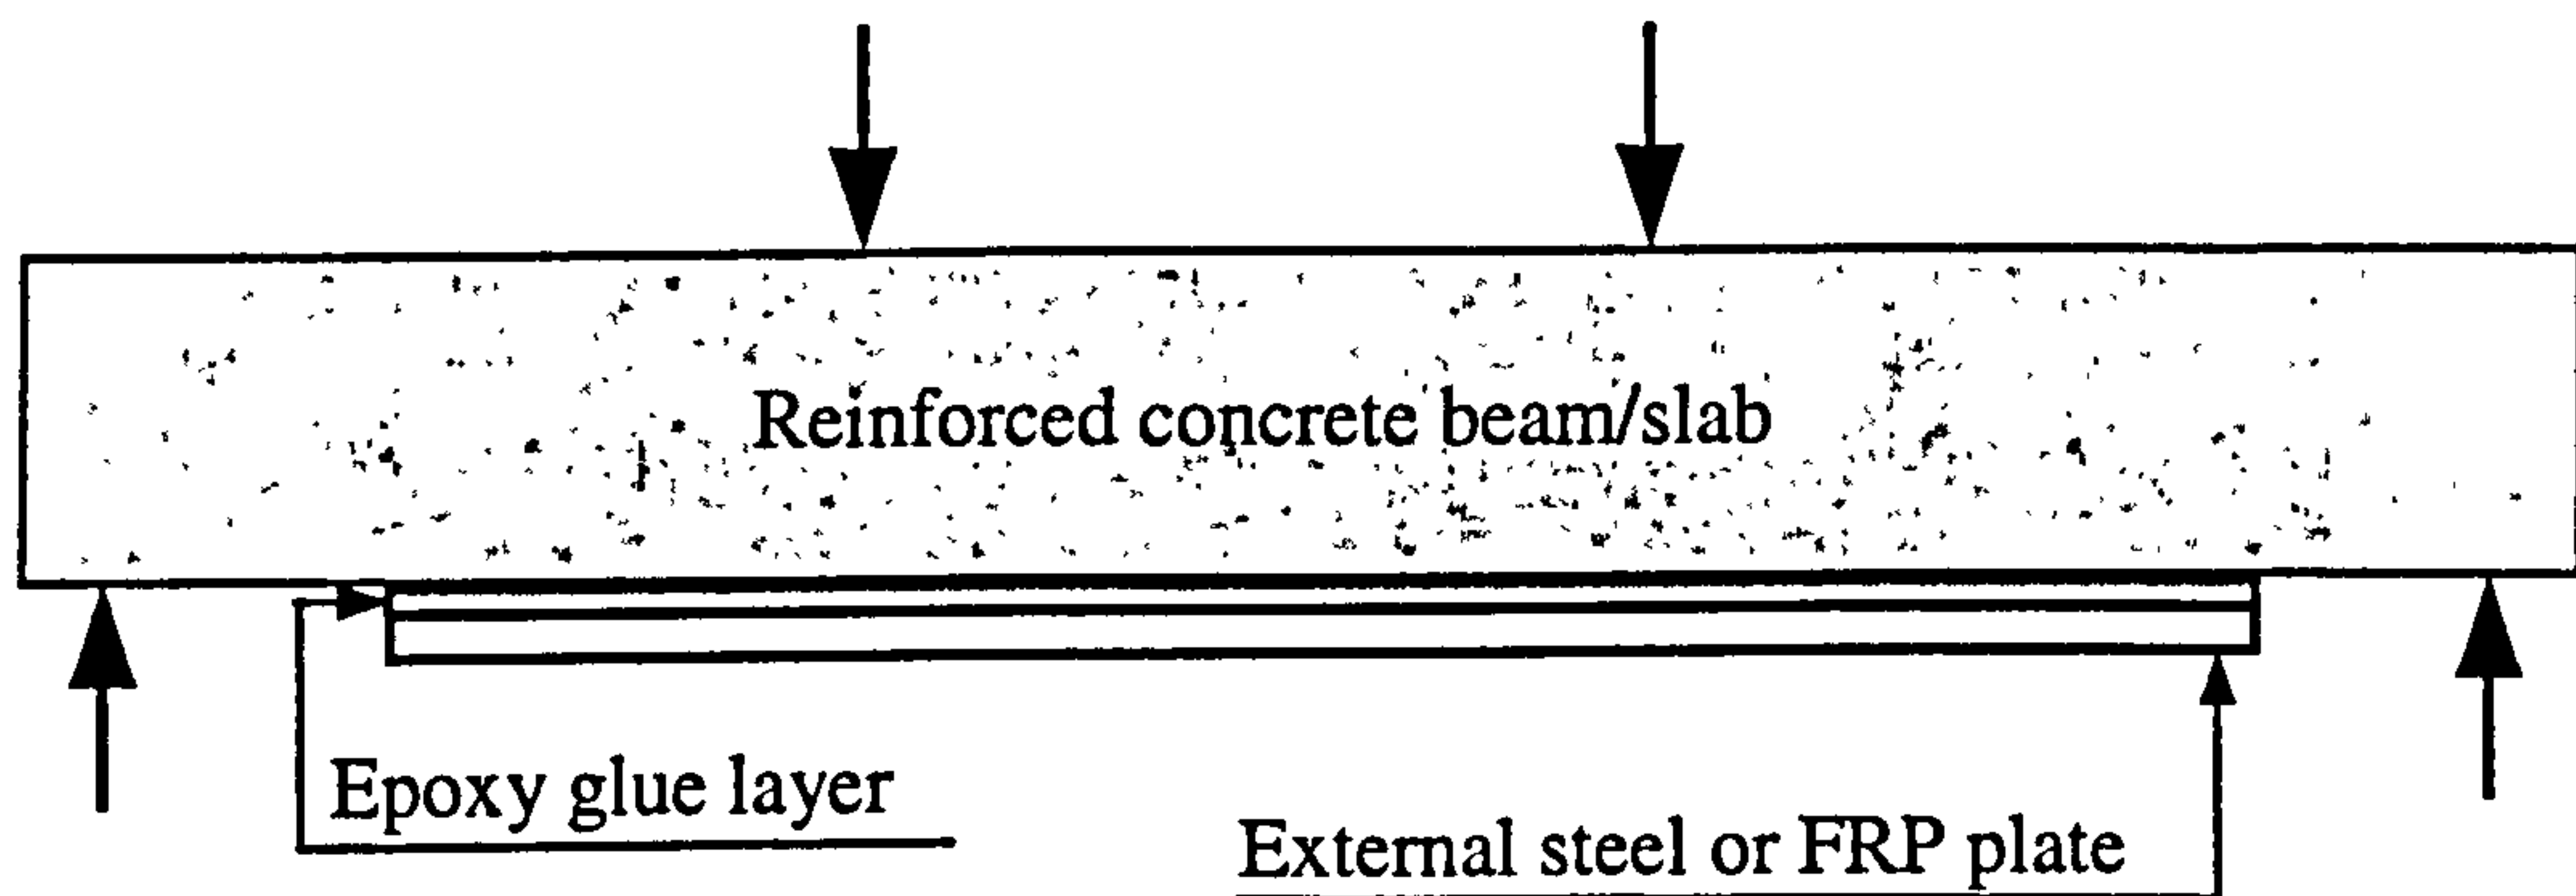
Reinforced concrete beam strengthened with externally bonded steel/FRP plate.
